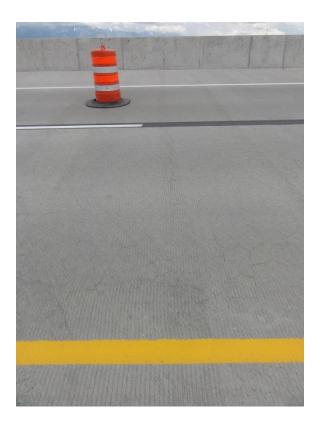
Reflection cracking from half-deck concrete panels in Dannon Way northbound internally cured concrete deck at 1 year.
